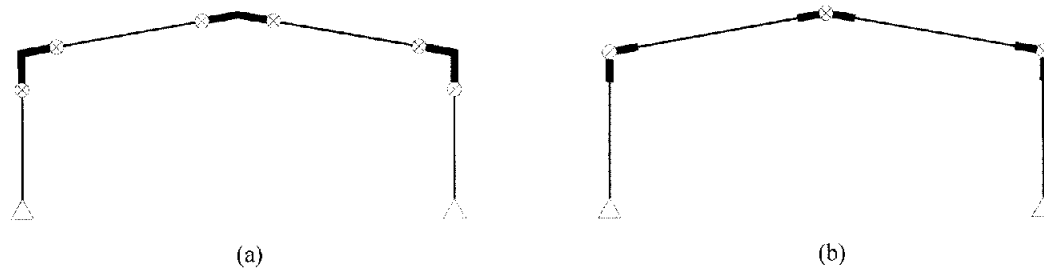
Frame models accounting for connection flexibility: detailed (a) and simplified (b).
